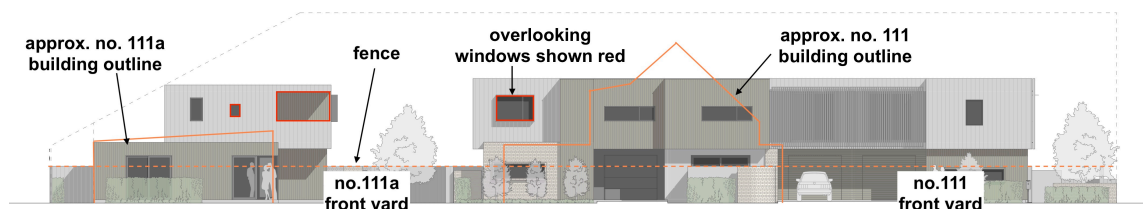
East Elevation (dwelling 5 on left, dwelling 1 on right)
